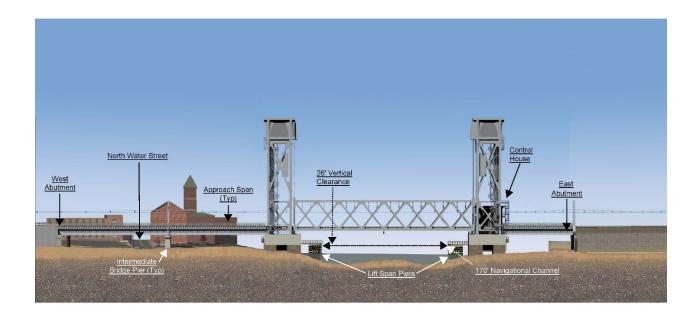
Elevation View of the Long Span Vertical Lift Bridge, Refined Design
